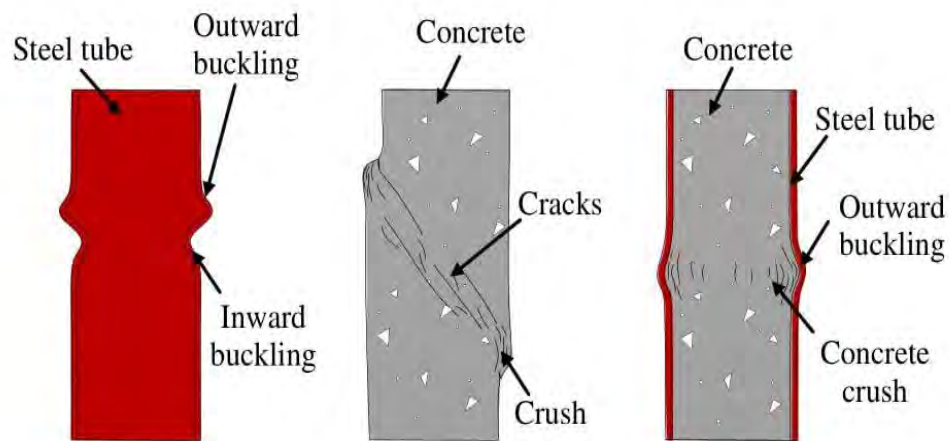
Schematic failure modes of hollow steel tube, concrete and CFST stub columns (Han et al., 2014)
